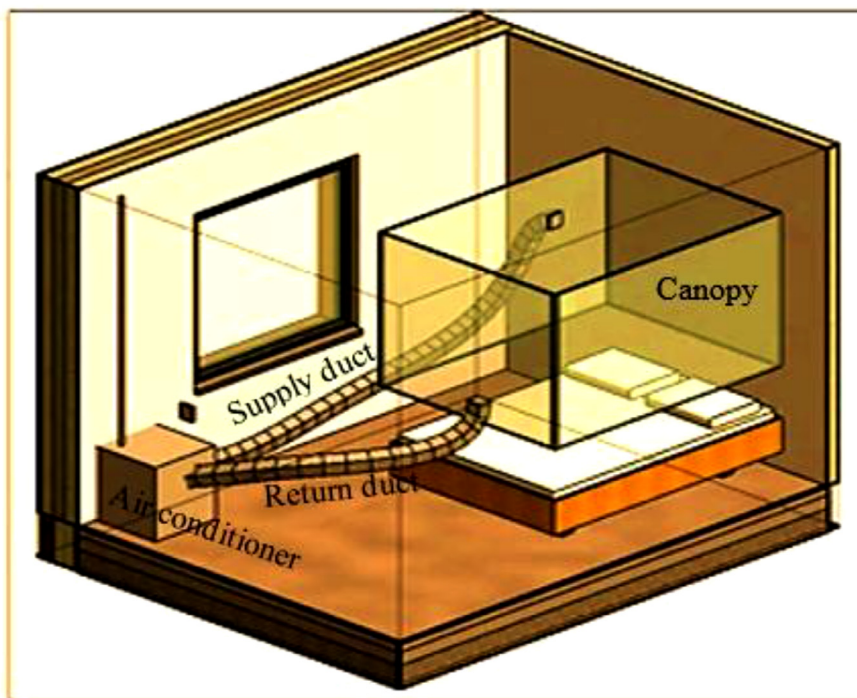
Room layout showing system layout, and 3D view of a typical bedroom.
